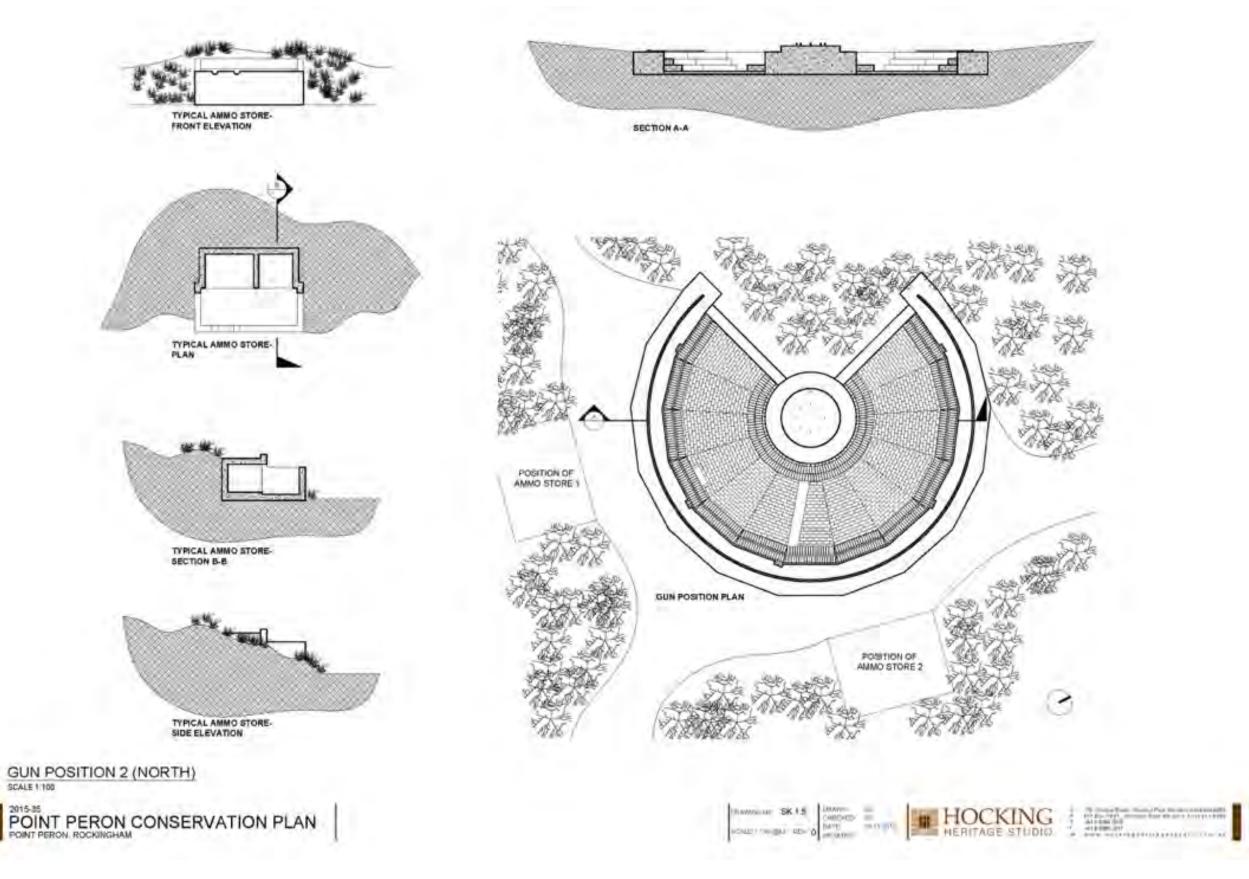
Gun Emplacement No. 2 - Plans and Elevations
